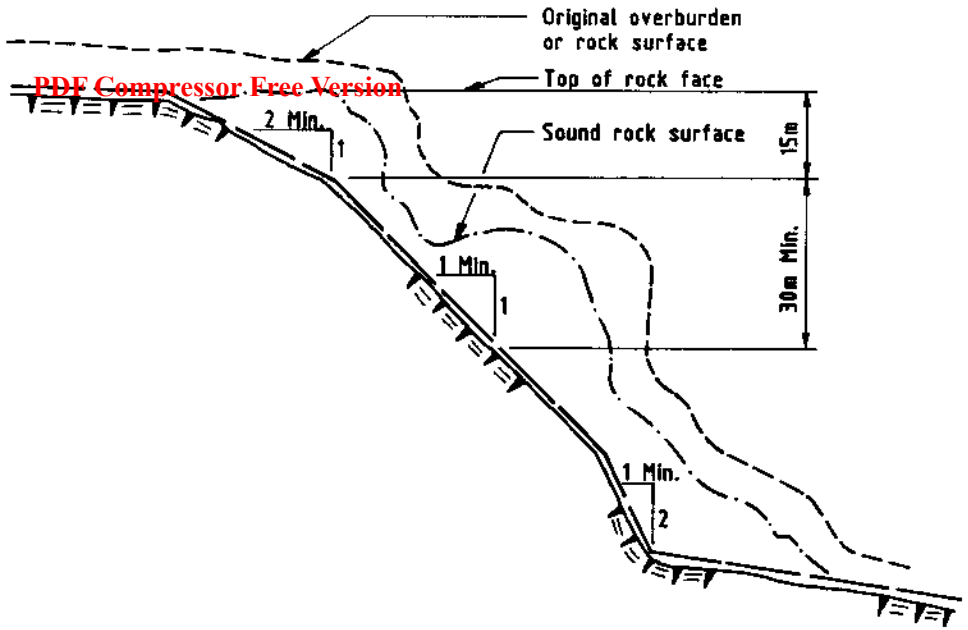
Bennet Dam, typical core abutment excavation requirements (Pratt et al. 1972).
